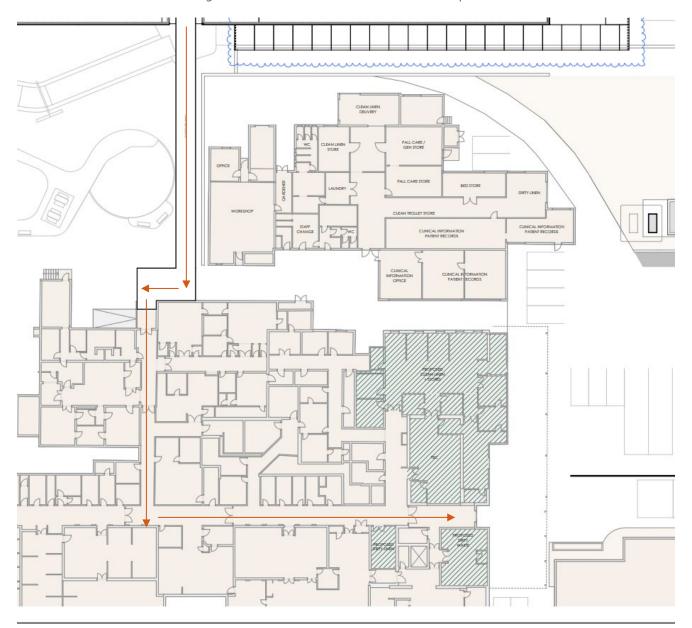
Site Plan – Logistics Workflow and Proposed Central Waste Holding Space
